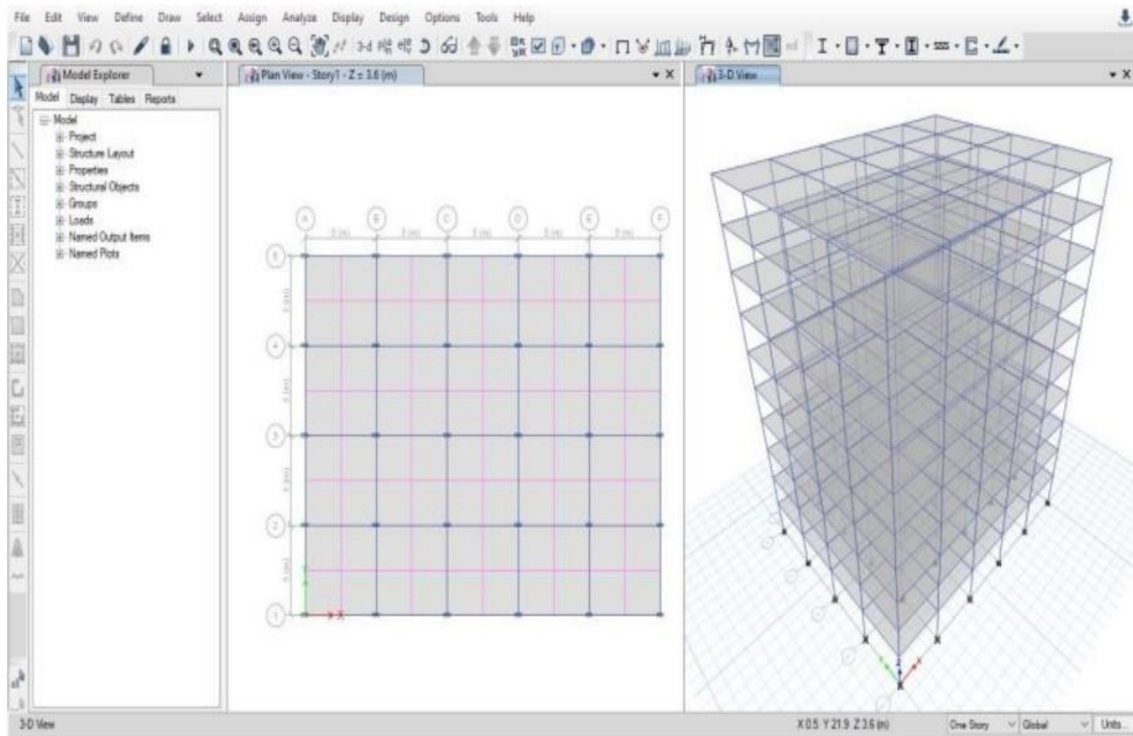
Plan and Elevation of (G+10) Building
